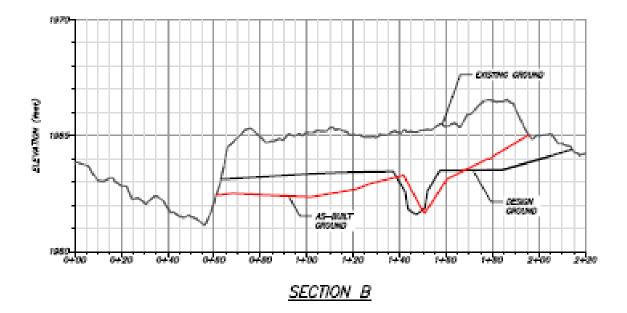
Cross section of parking lot fill removal area (see Figure 17 for cross section location).
